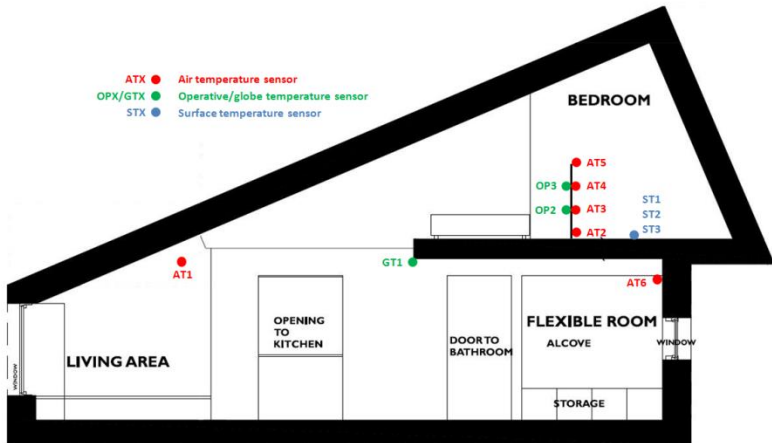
Elevation of the EMBRACE house with locations of sensors.
